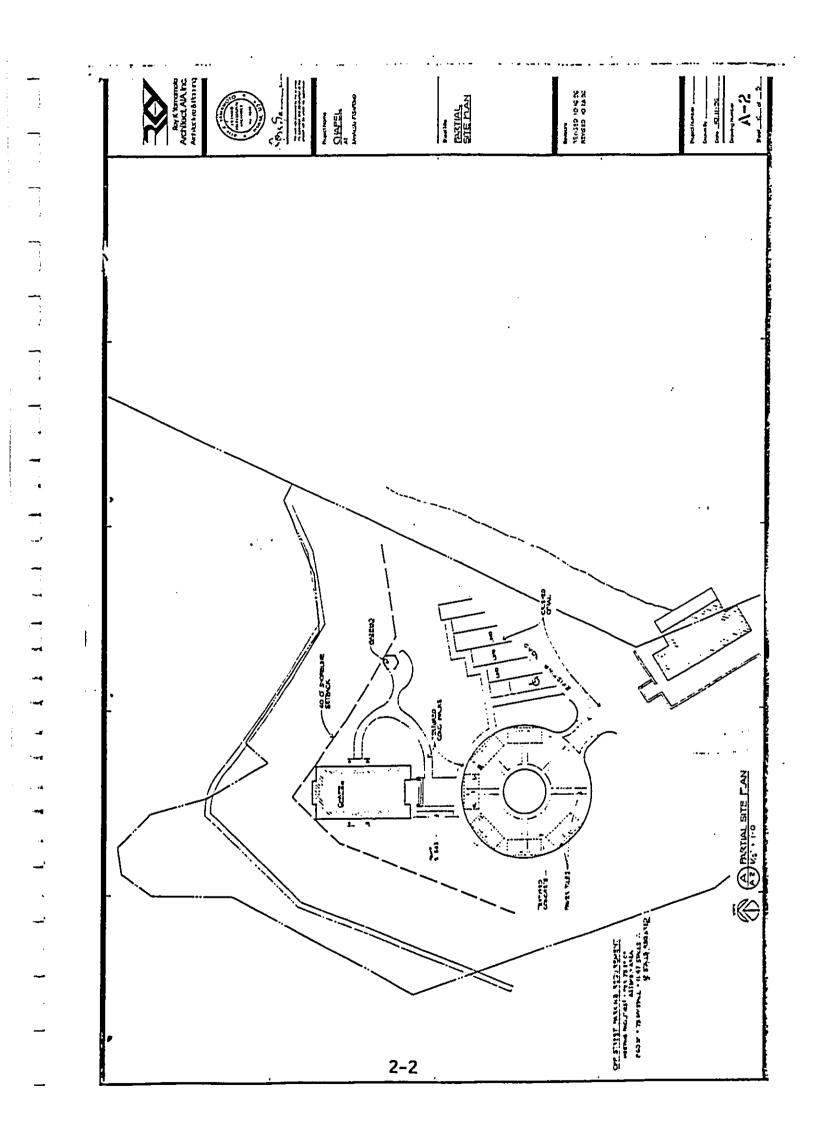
depicts the conceptual site plan for the wedding chapel at full development. Figure 2-3 depicts the conceptual landscaping plan in association with the proposed chapel. As the chapel is small in size (<1500 sq. ft.) the entire project will be constructed in one phase, including the onsite and off-site improvements.
